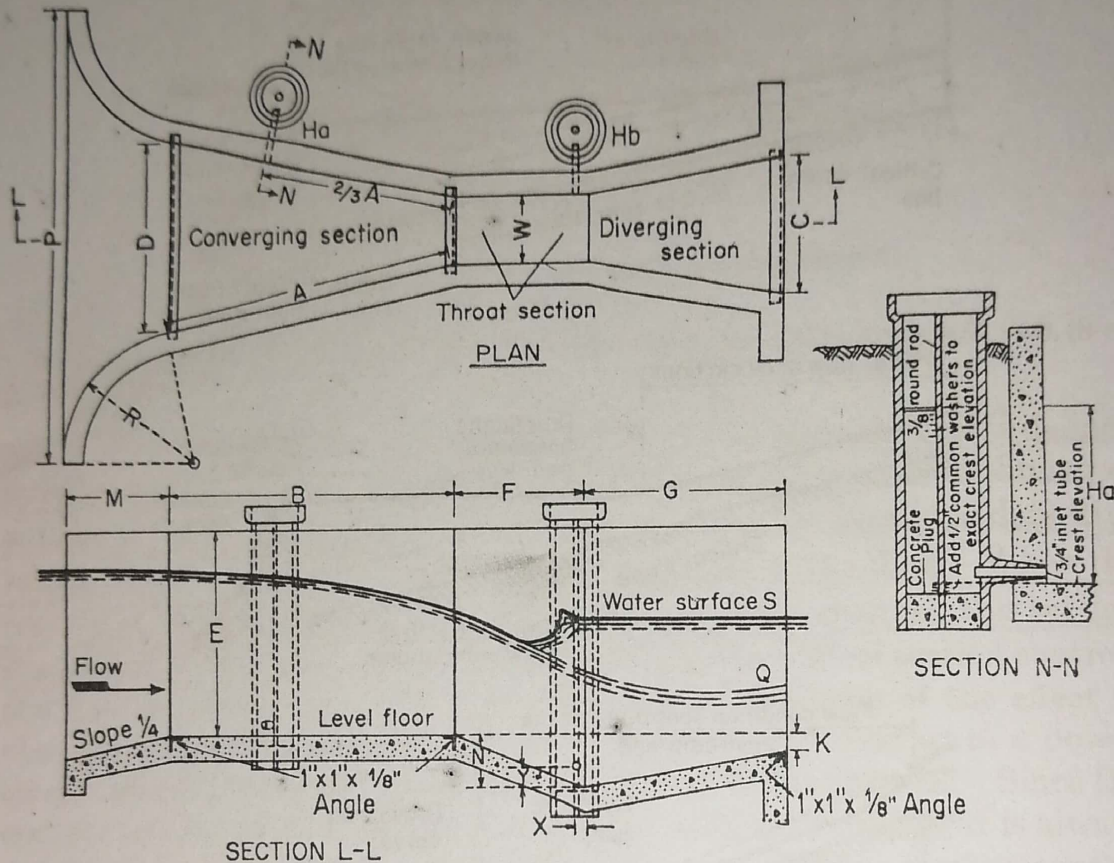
Plan, elevation, and dimensions of the Parshall flume. (U.S. Soil Conservation Service [26].) Plan and elevation of a concrete Parshall measuring flume showing lettered dimensions as follows:
